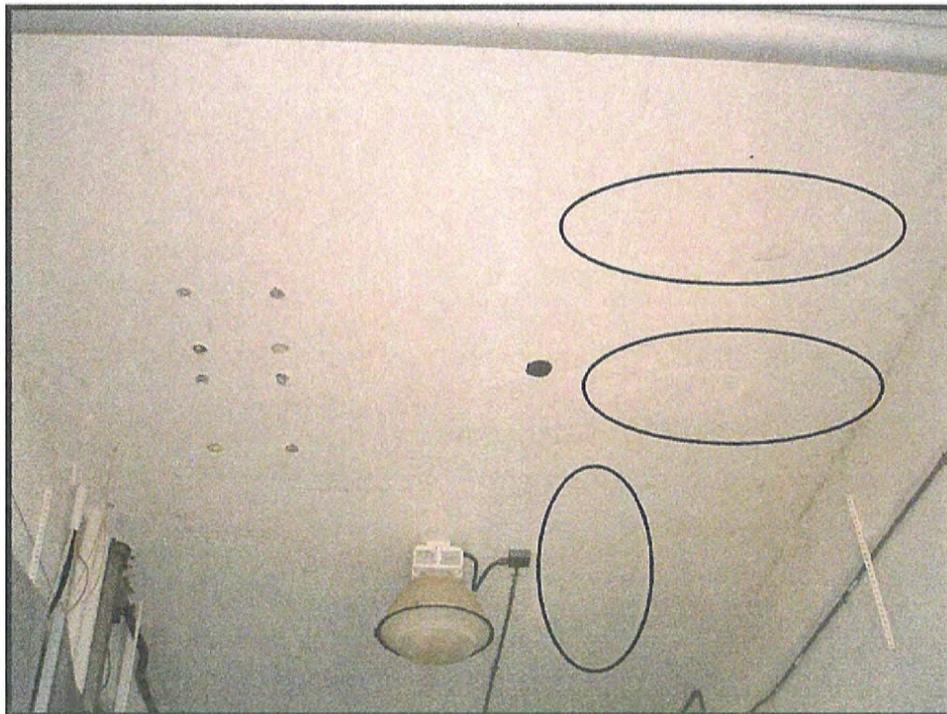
Delaminations along underside of second level slab typically found in all six service bay areas.
